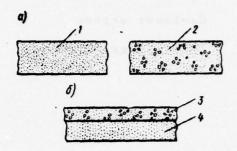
Silicate-concrete slabs: a-single-layer for bases and pavements of road toppings: 1-of fine-grained concrete; 2-of large-grained concrete; b-double-layer for pavements of road toppings; 3-upper layer of fine-grained concrete; 4-lower layer of fine-grained concrete.
